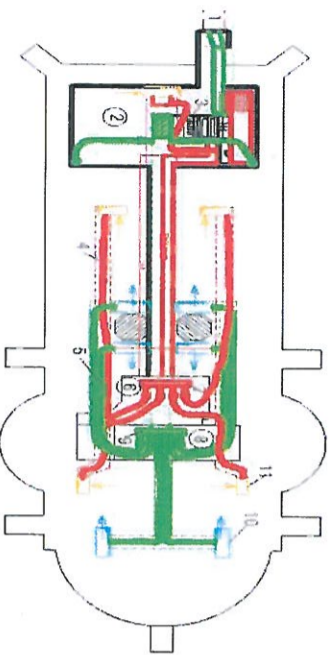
Networks existing air channels under the floor: 1-fresh air intake channel; 2-basement of porch; 3- air handling unit; 4-flexible pipe connected to the suction grid; 5- flexible pipe connected to the outlet grid; 6- suction chamber; 7- exhaust air collector; 8- pressure side chamber; 9- treated air collector; 10-outlet grid; 11- suction grid
